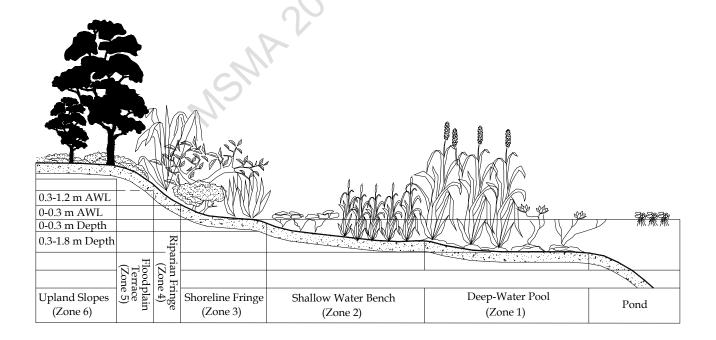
Longitudinal Section of Typical Pond or Wetland
